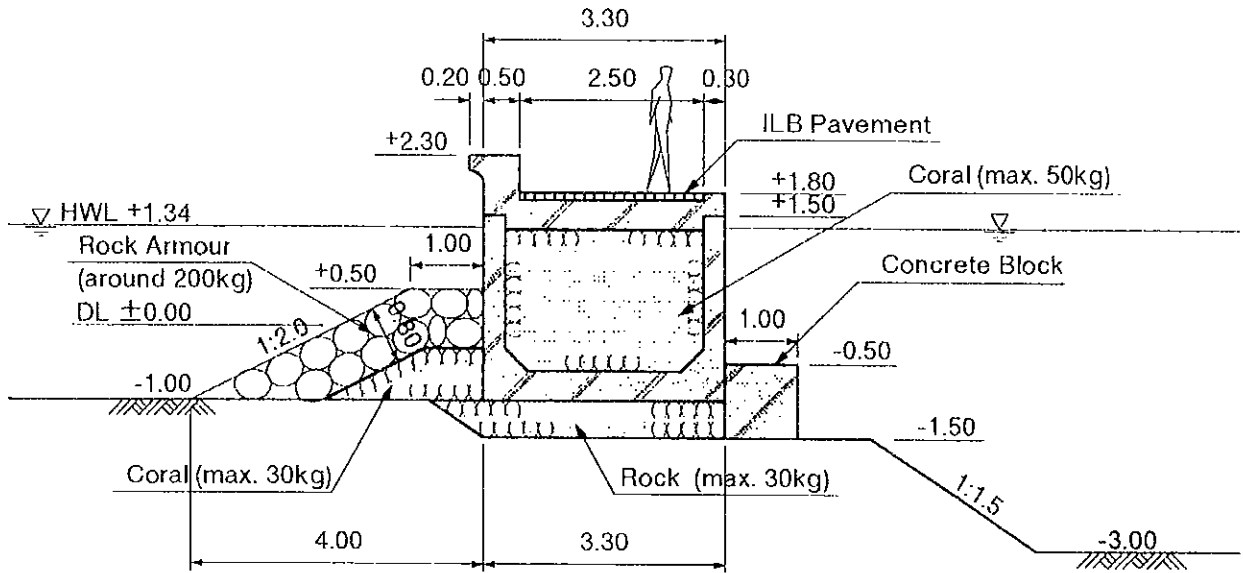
Standard Cross Section of Seawall - Type C
